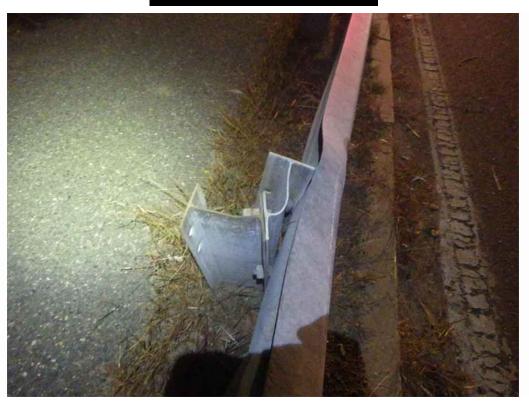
Northwest Approach Guardrail, Rail Post #11, Looking North - Collision damage to guardrail, and bent rail post.
